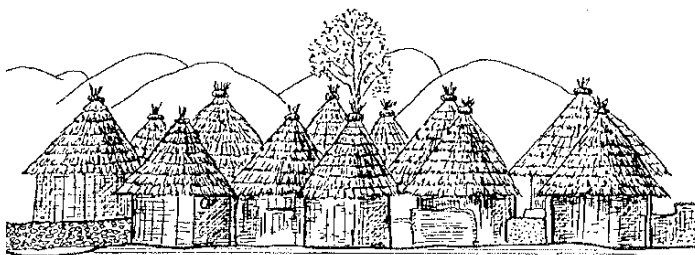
Elevations, traditional Higgi architecture. Adapted from Saad (1991)
